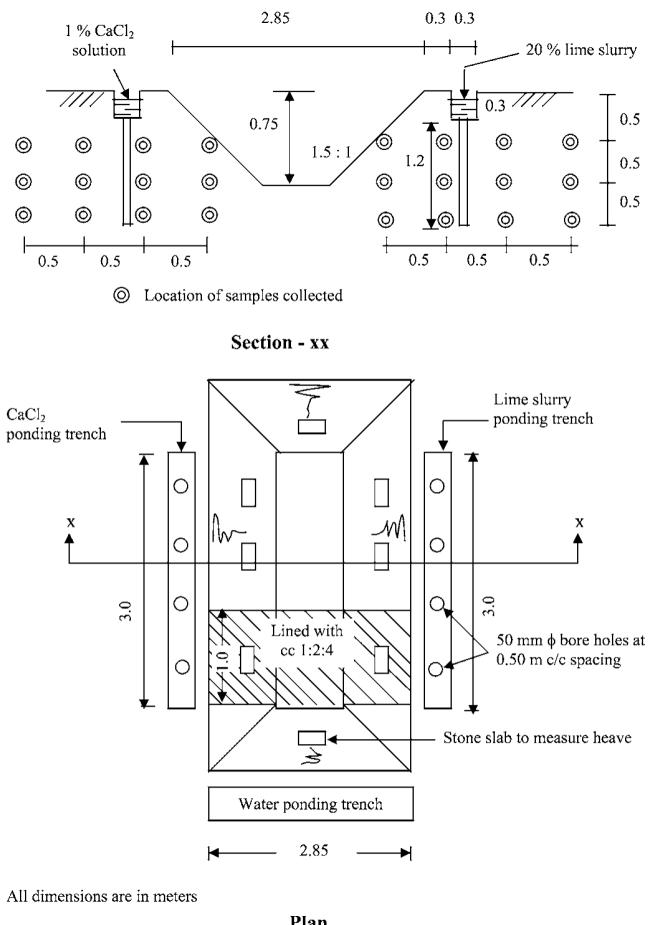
Details of trapezoidal trench made in expansive clay bed
